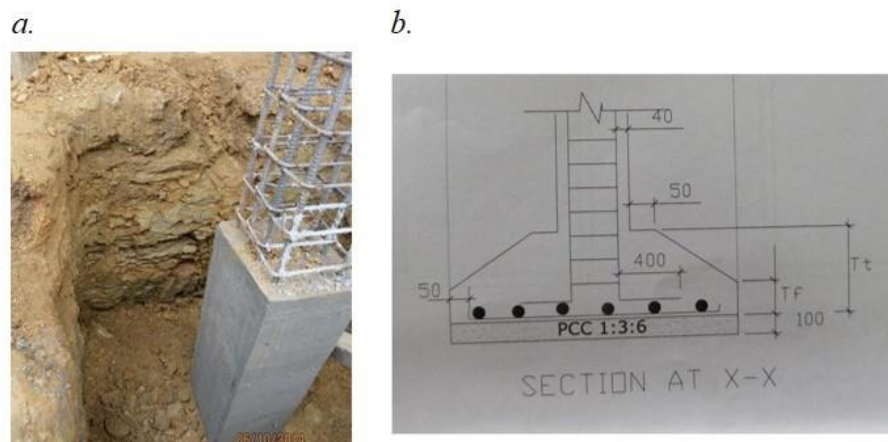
(a) Typical foundation column excavation and (b) building diagram for spread footings (diagram reproduced with permission of Aizawl Municipal Council).
